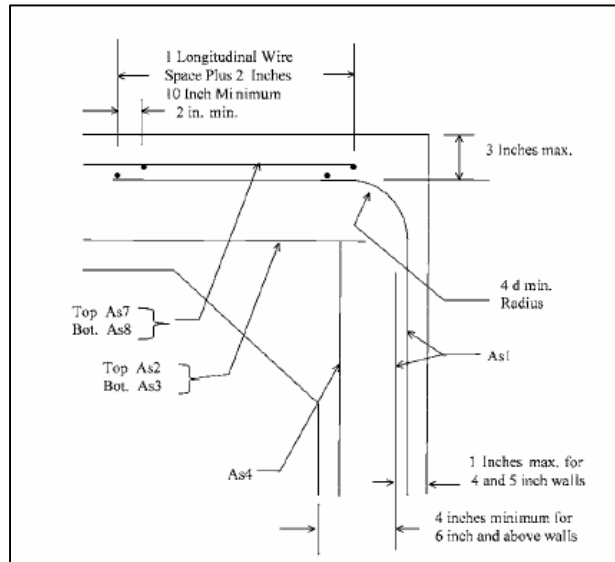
ASTM 1433 - Detailed Reinforcement Arrangement.
